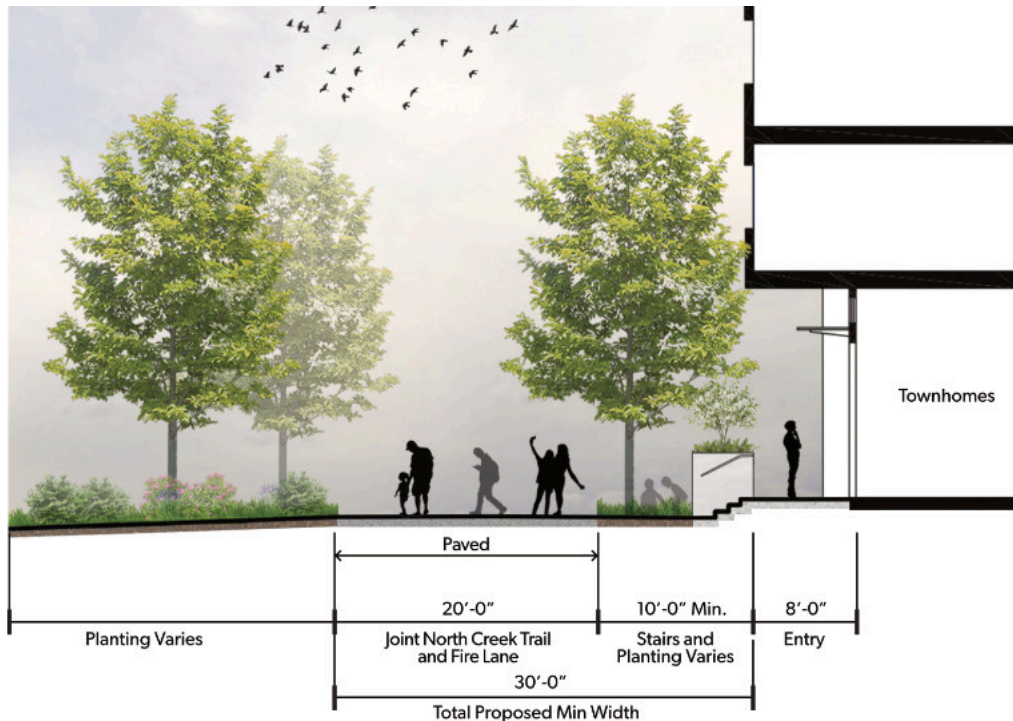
K-K | Joint North Creek Trail and Fire Lane
